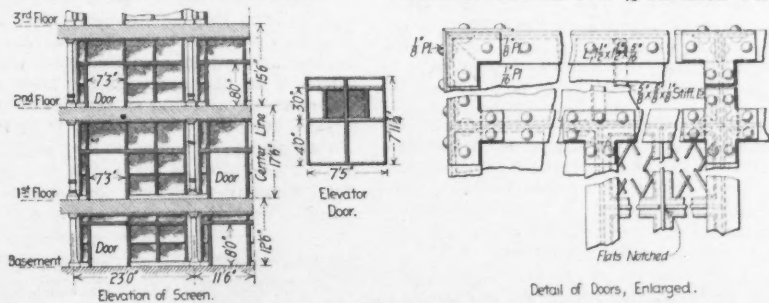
HALF ELEVATION OF FIREPROOF SCREEN SHOWING DETAILS OF ELEVATOR DOORS.
